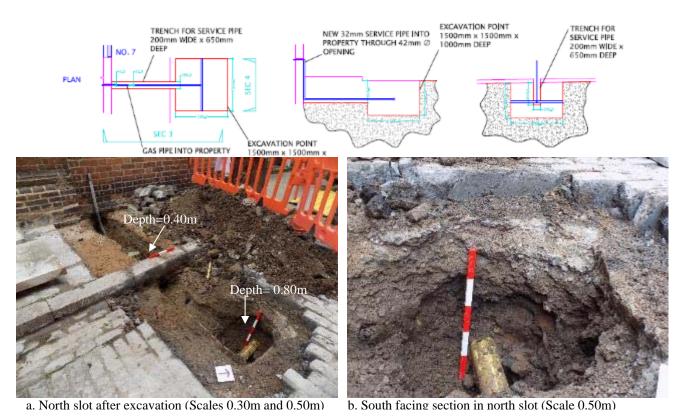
External connections at No.7 Castle view (provided by Client) and photographs after excavation.
